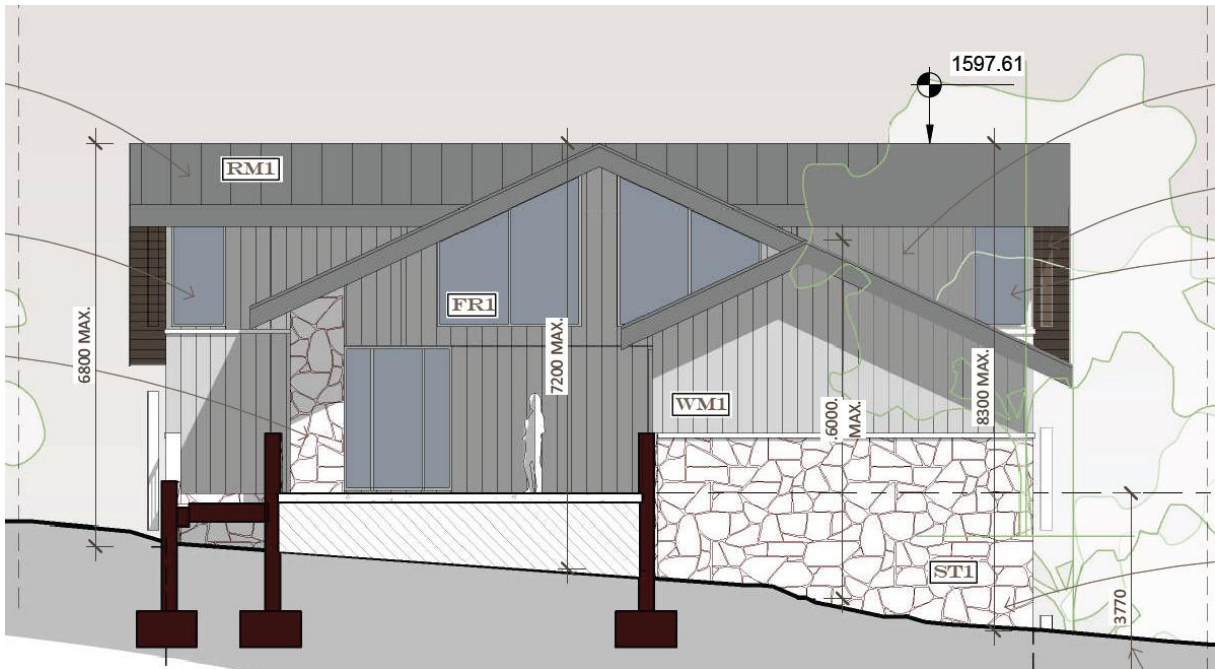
Endorsed Eastern Elevation (to The Avenue)
